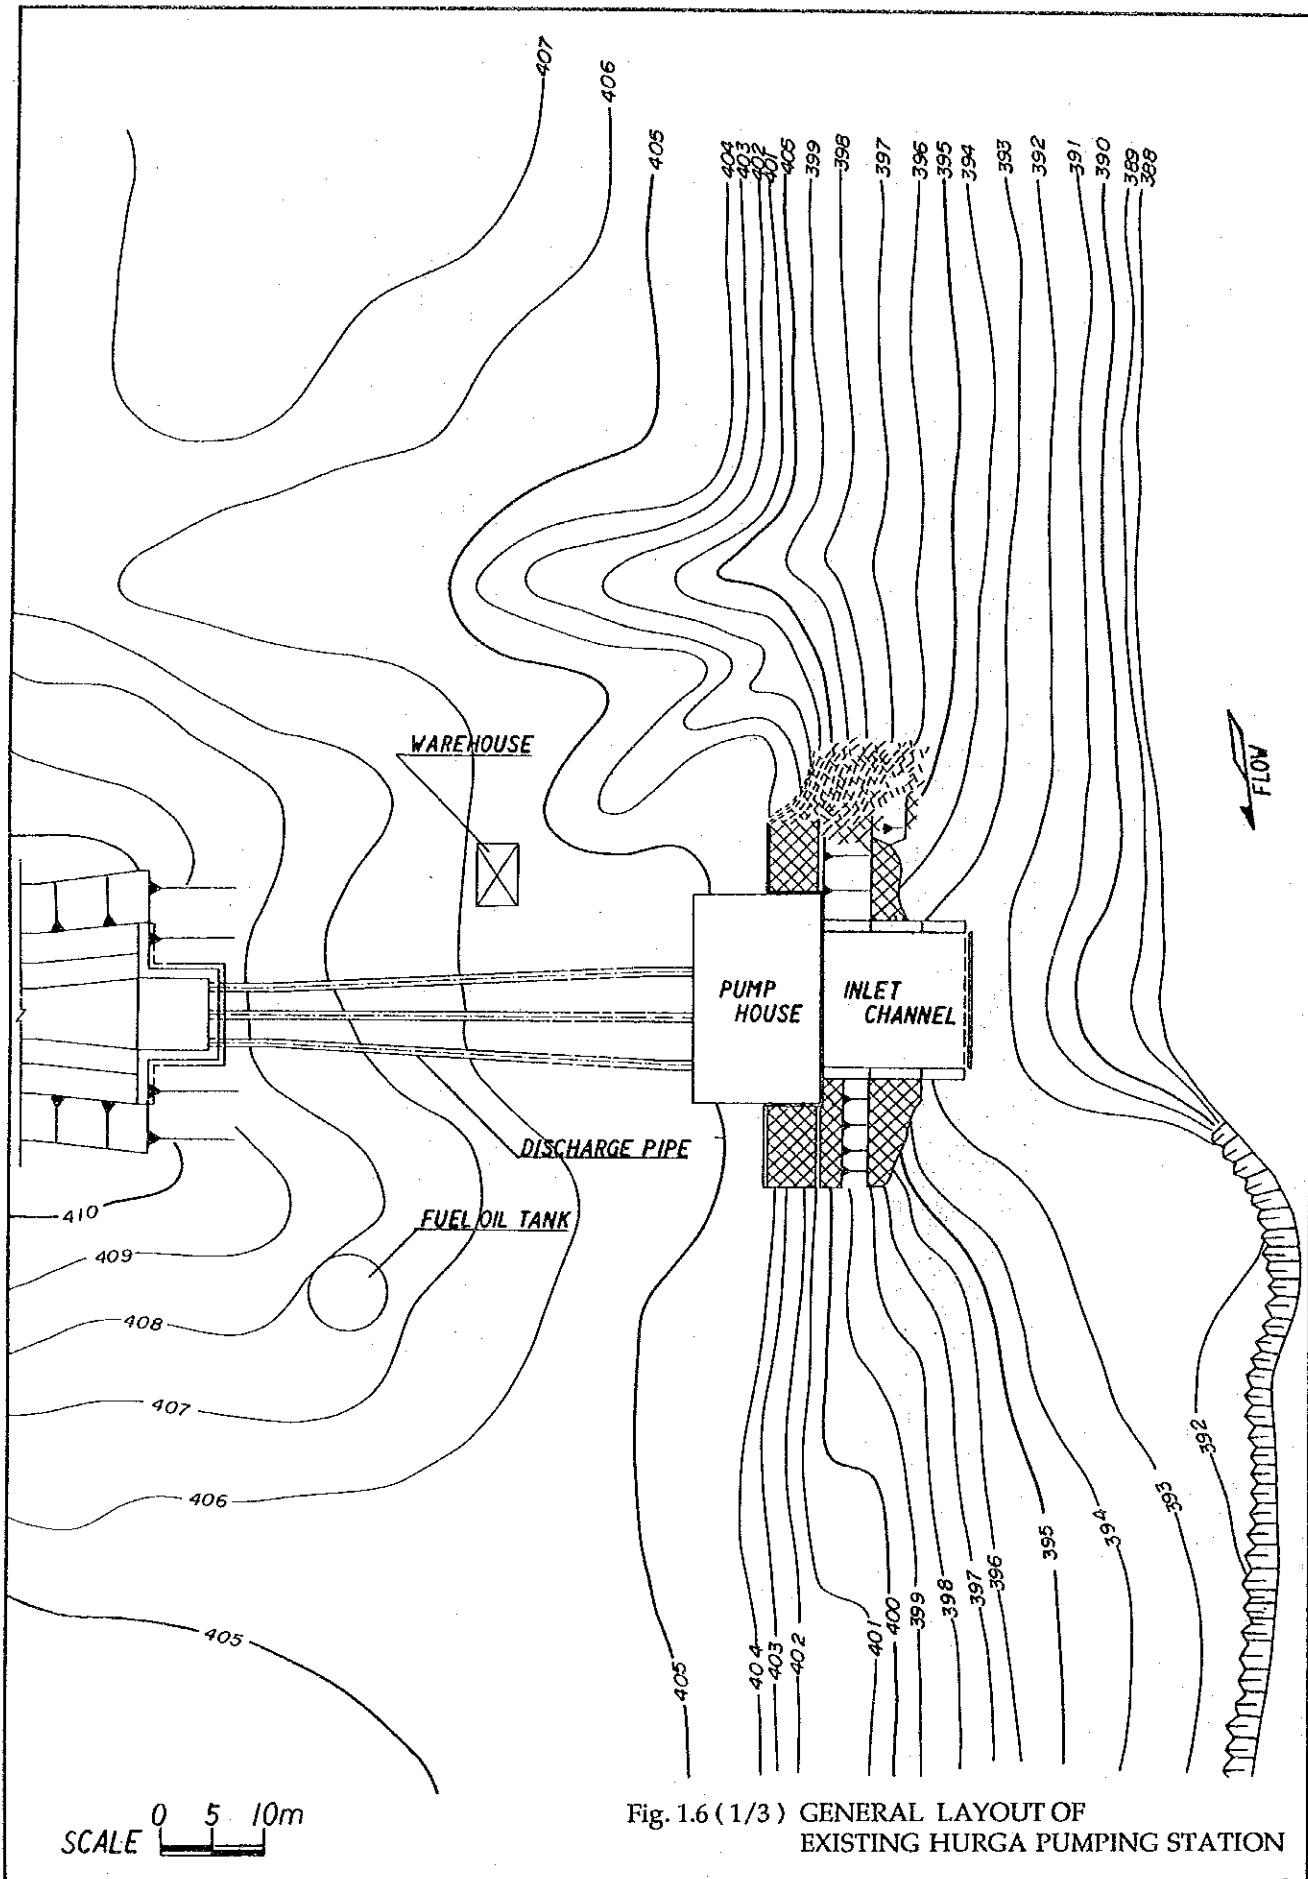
(1/3) GENERAL LAYOUT OF EXISTING HURGA PUMPING STATION
